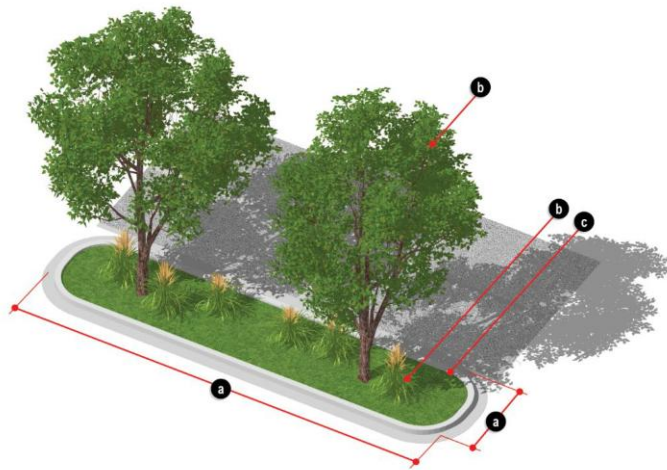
Interior Parking Area Landscape Requirements For Parking Areas Located In Rear of Principal Building
